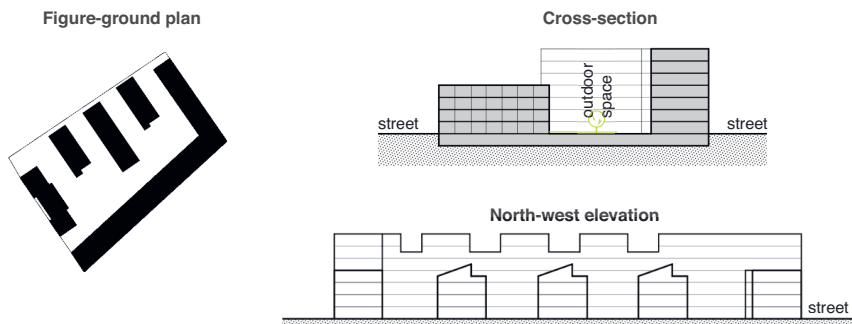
Example of variation of podium type with the lowest storey entirely under the ground – plan drawing (within zoning plan limits), section showing built and outdoor spaces relative to the surrounding streets, and north-west elevation; case located in Sigurd Hoels vei 42–110
